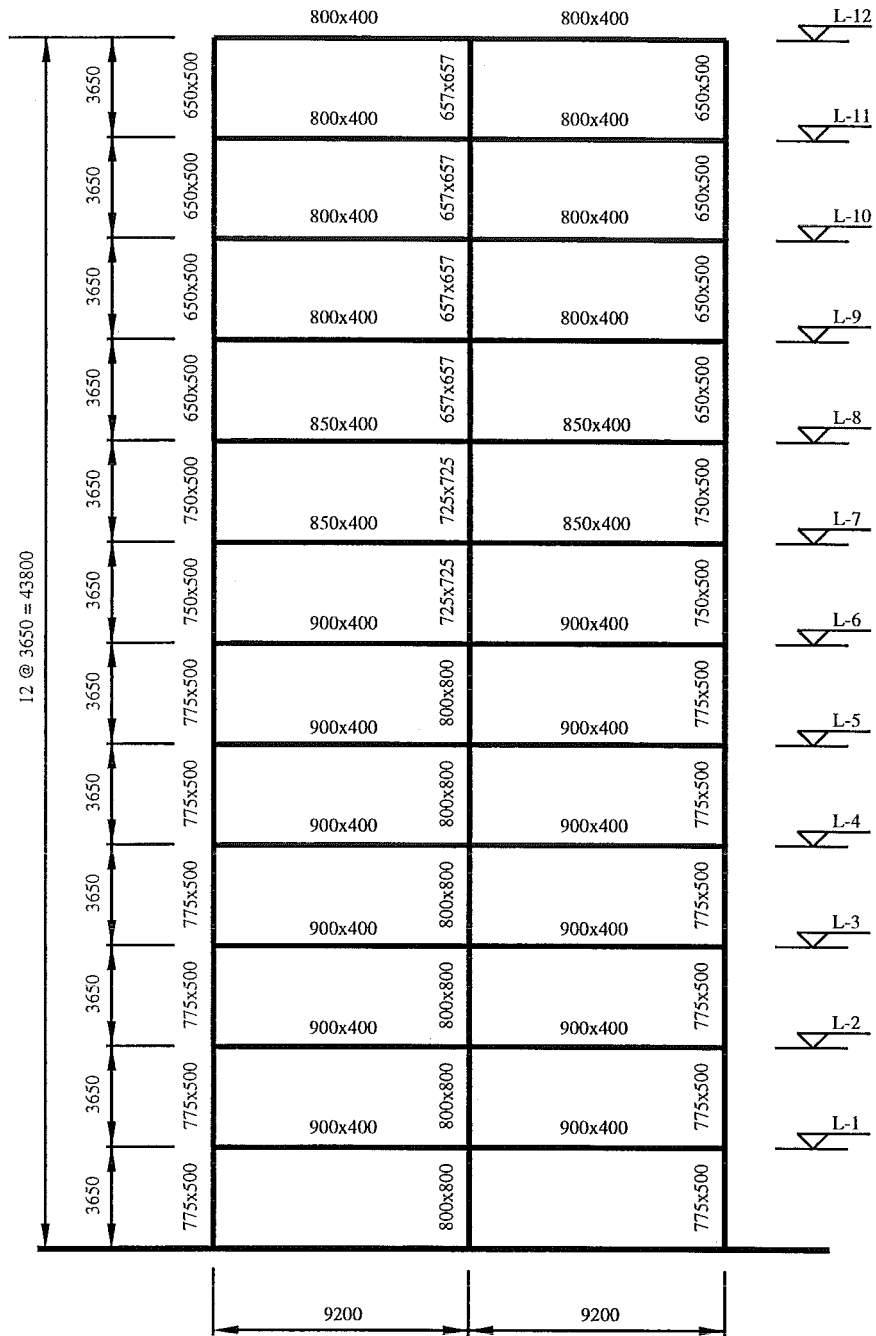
Jury two-bay twelve-storey ductile-framed structure of reinforced concrete
